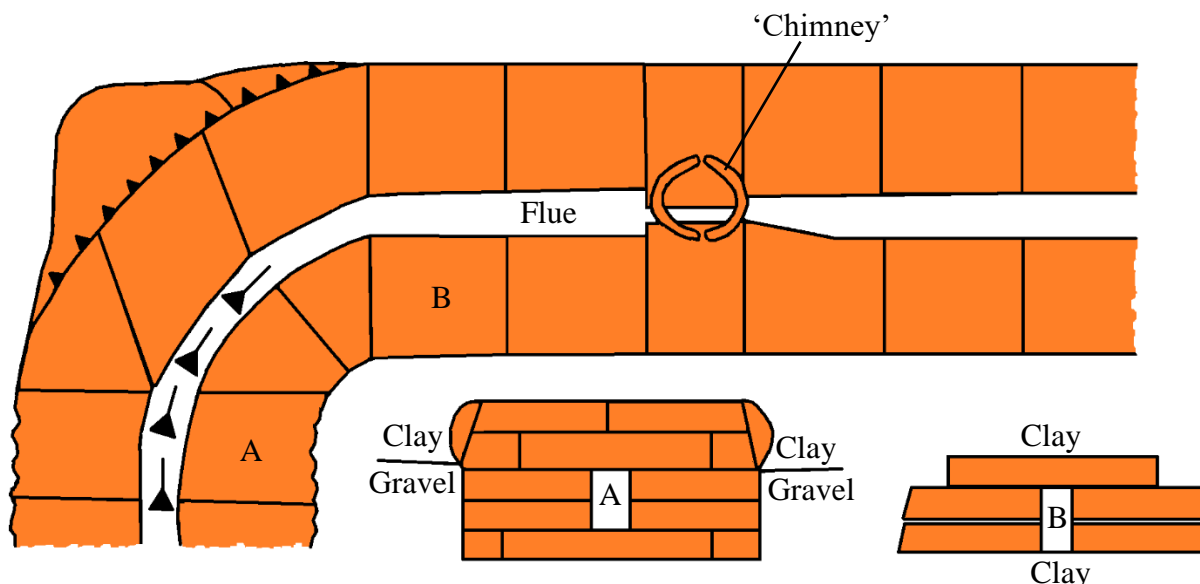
Probably Schematic Plan (Roof Omitted) of the Structure 2 Flue and its Construction at Two Points
